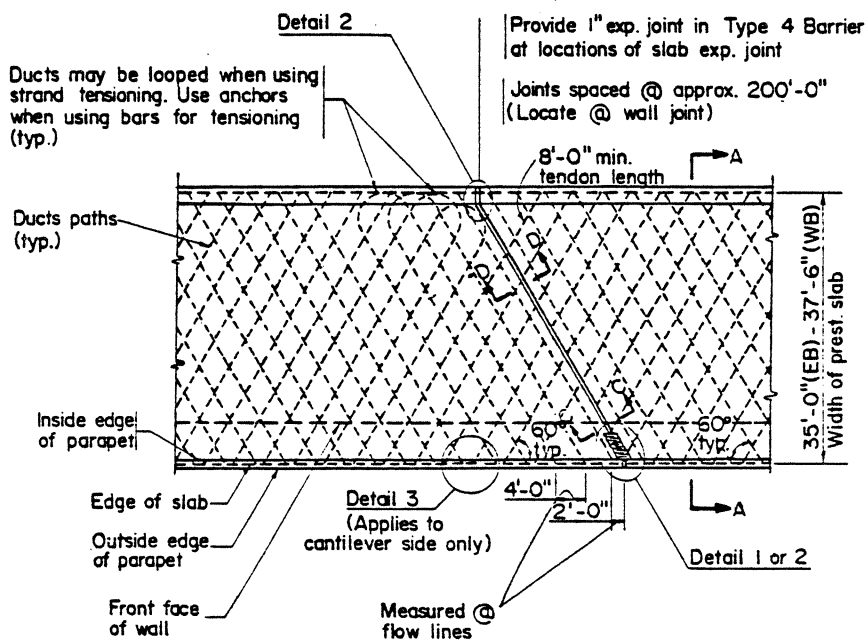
Plan of roadway slab showing location of post-tensioning tendons.
